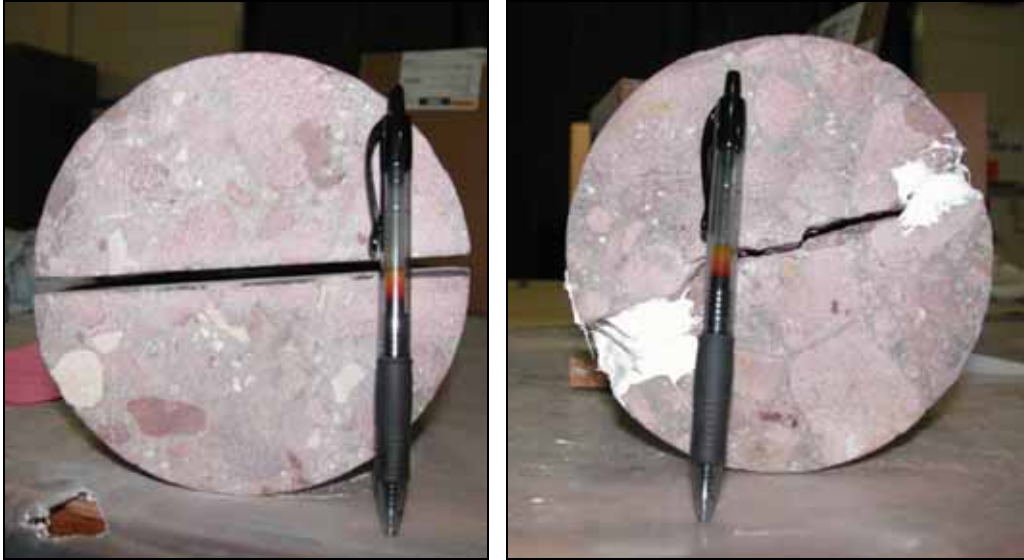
Saw-cut and splitting tension 150-mm (6-in) diameter crack test specimens.
